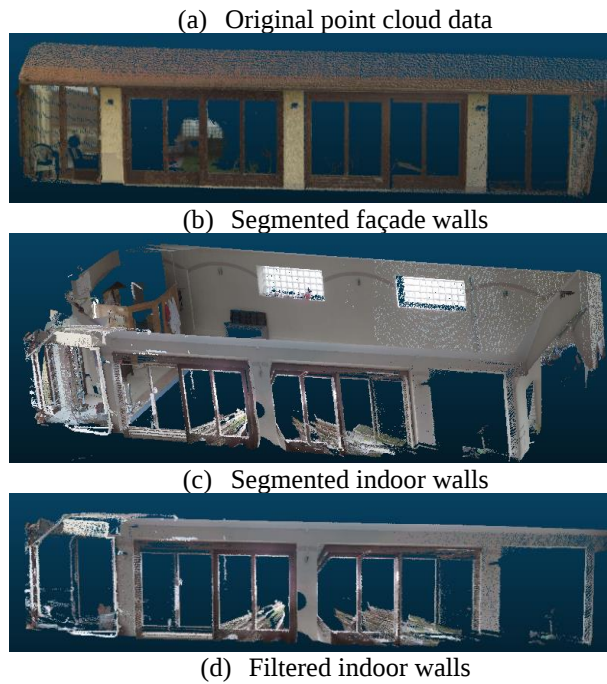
Segmented walls. (a). Original point cloud data, (b). Segmented façade walls, (c) segmented indoor walls, (d) Filtered indoor walls.
